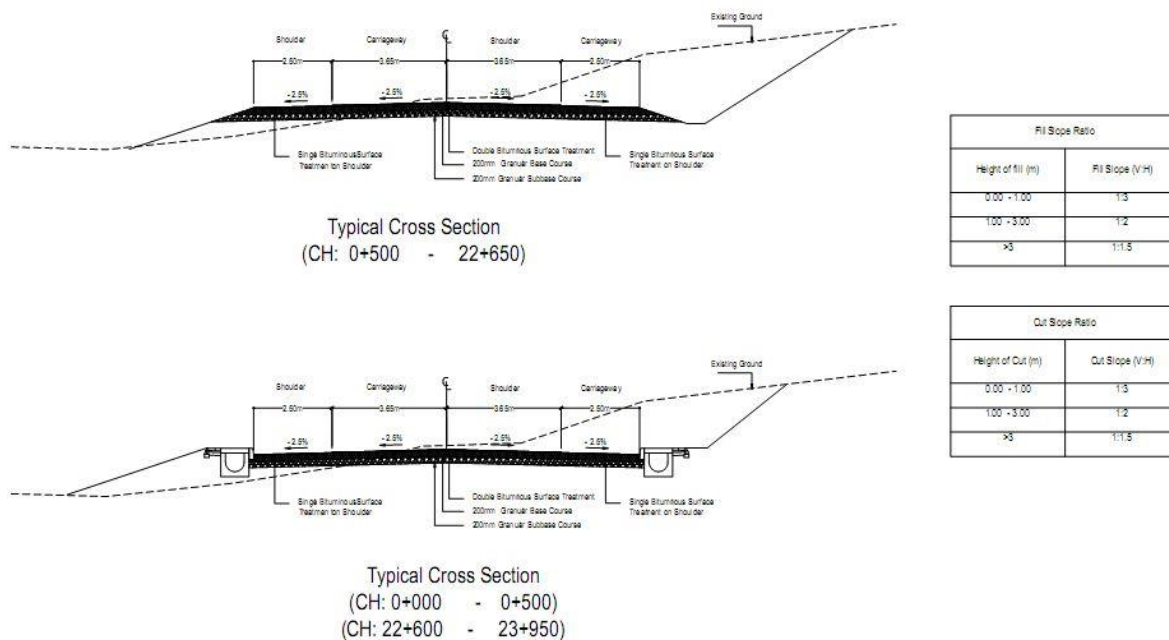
Typical Cross Section of Asutuaire – Aveyime Road (Section 2 Project Road)
